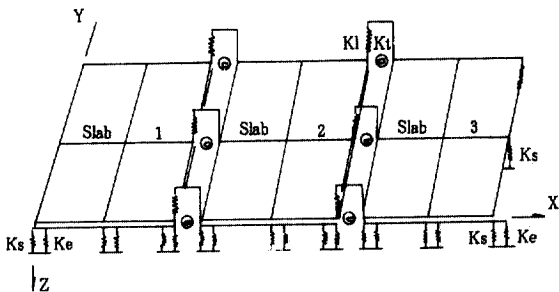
Finite Element Modeling of a Three Slab Pavement System (Ref. 1).
